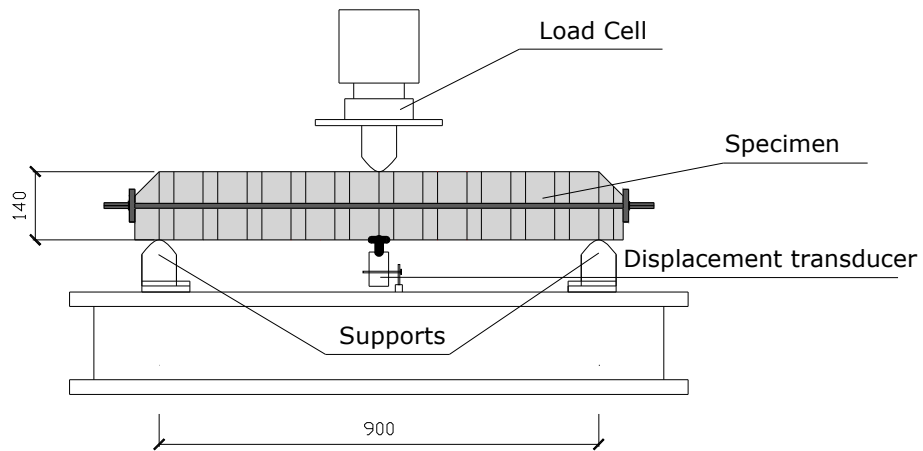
Details of out-of-plane loading system for three-point bending tests
